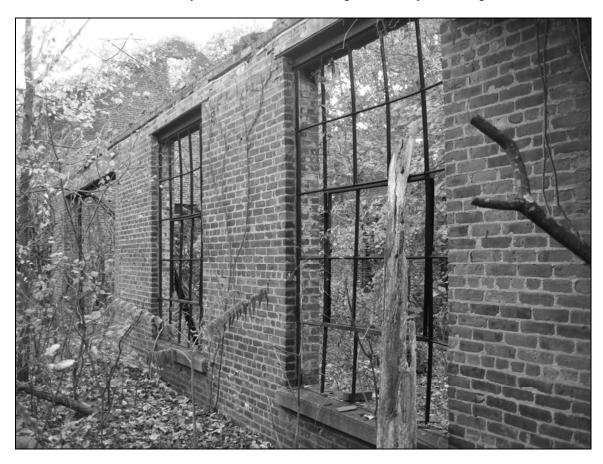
One-and-a-half story main section of east wing, eastern façade, facing southwest.
